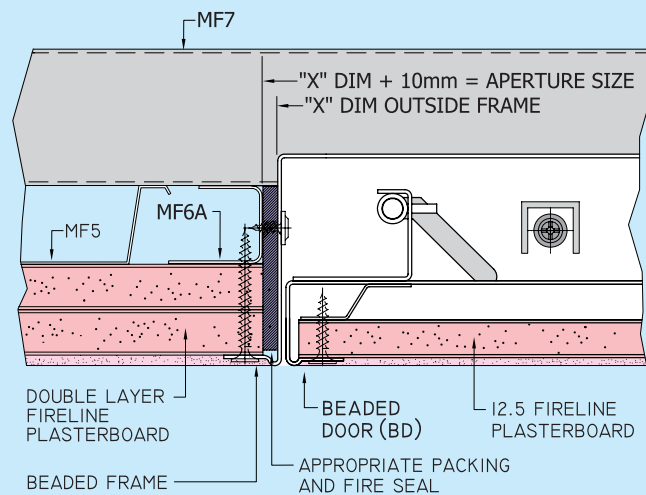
SECTION BB BEADED DOOR WITH BEADED FRAME FIRE RATED
